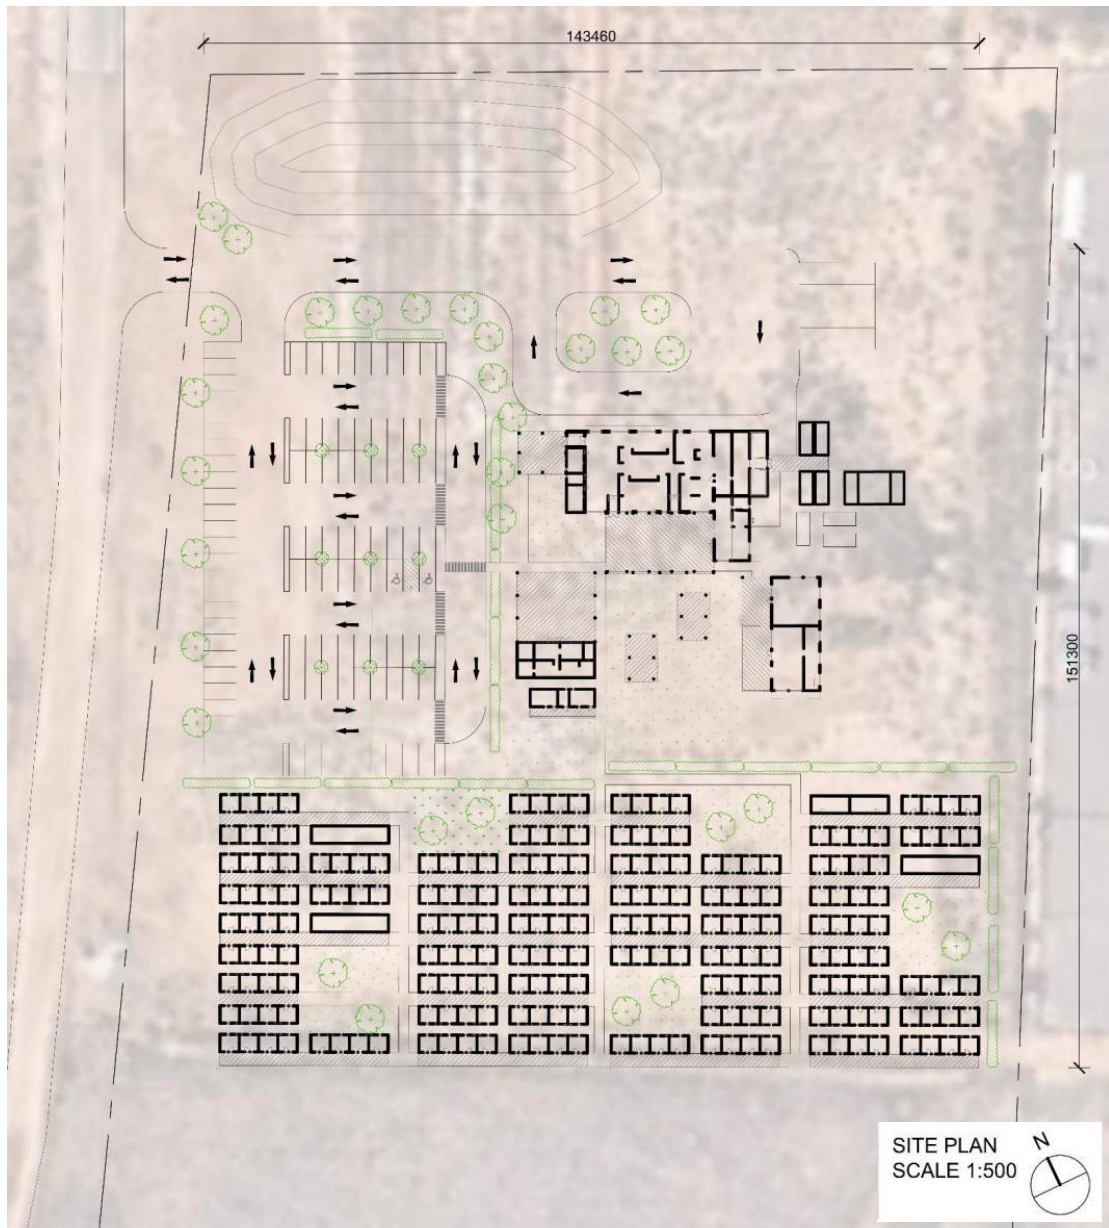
Proposed new development site plan (source: Grounded, 2022)
